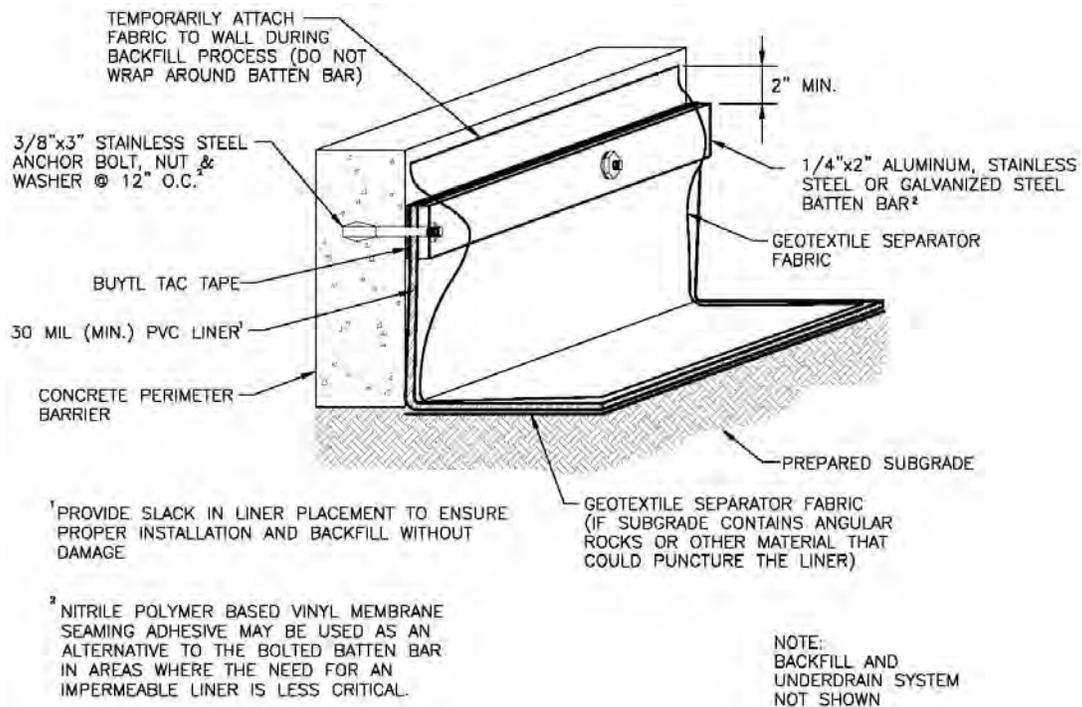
Geomembrane Liner/Concrete Connection Detail
